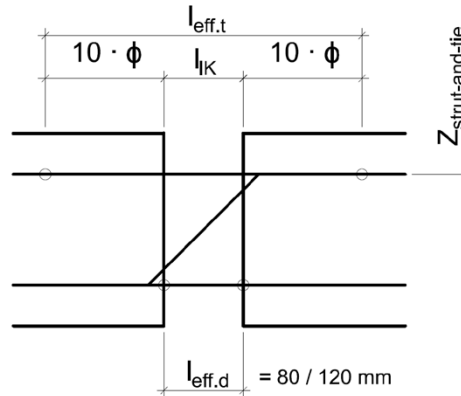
$l_{eff}$  for tension bars made of stainless reinforcing steel in the joint and concrete compression elements (CCE)
